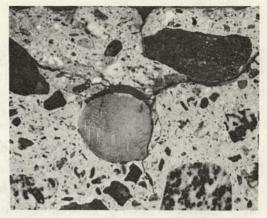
Cross section of reinforcing steel and part of surface spall showing cracking and associated corrosion of steel at upper surface.
